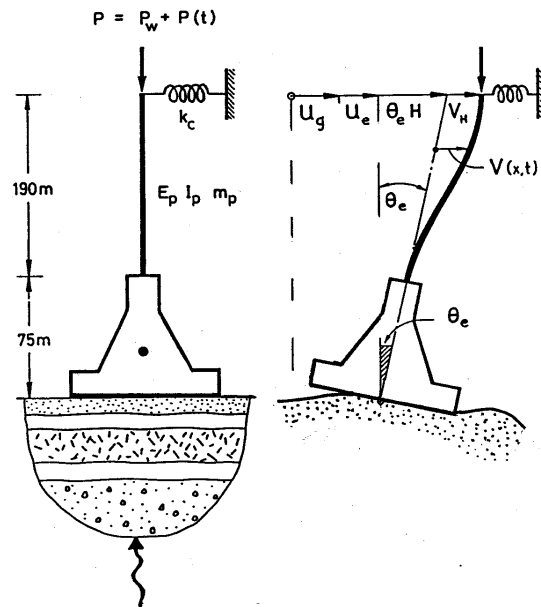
Sketch illustrating the SSI analysis for a pier of a hypothetical suspension bridge (Gazetas, 1988). Its analysis is similar to the one conducted for the piers of the cable-stayed bridge that is presently being constructed.
